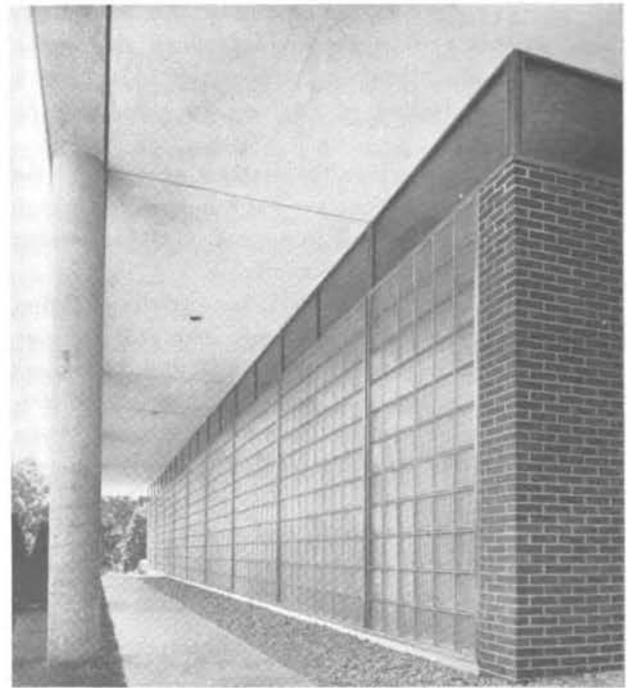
Glass block curtain wall in Y.M.C.A., Port Chester, N. Y.
